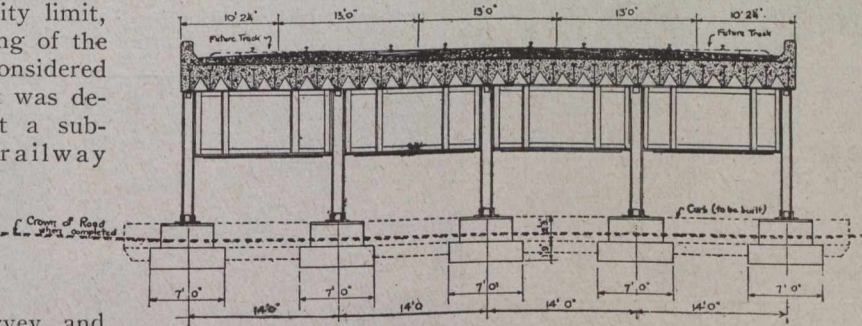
Cross-section of Bridge on Centre Line of Street.
